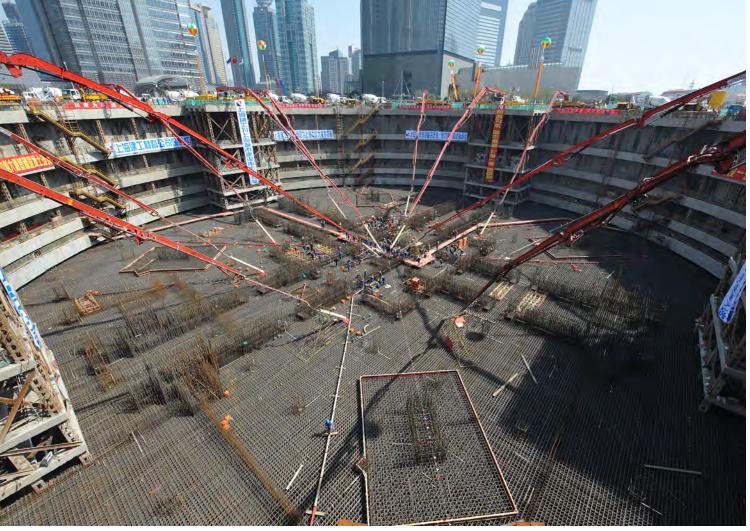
Concrete casting for the base slab of tower (Source: Shanghai Construction Group) 图5.8. 主楼大底板混凝土浇筑 (来源: 上海建工集团)
